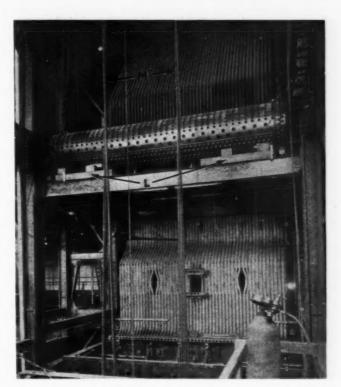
Placing mud drum. The boiler and furnace tubes shown are those of the opposite unit.
